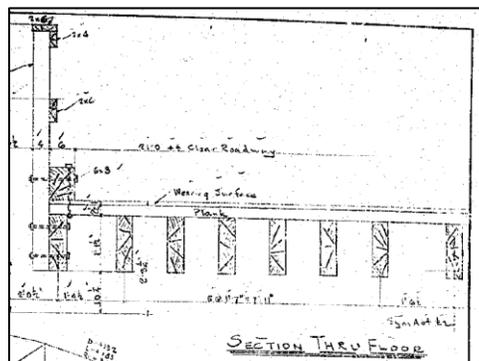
Historic shop drawing of through-section of bridge deck, showing steel superstructure, wood plank layer, and asphalt "wearing surface" layer. Source: McClintic-Marshall 1931.
